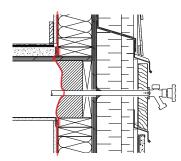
Wall penetration interior air barrier redline detail (annotations not shown).
